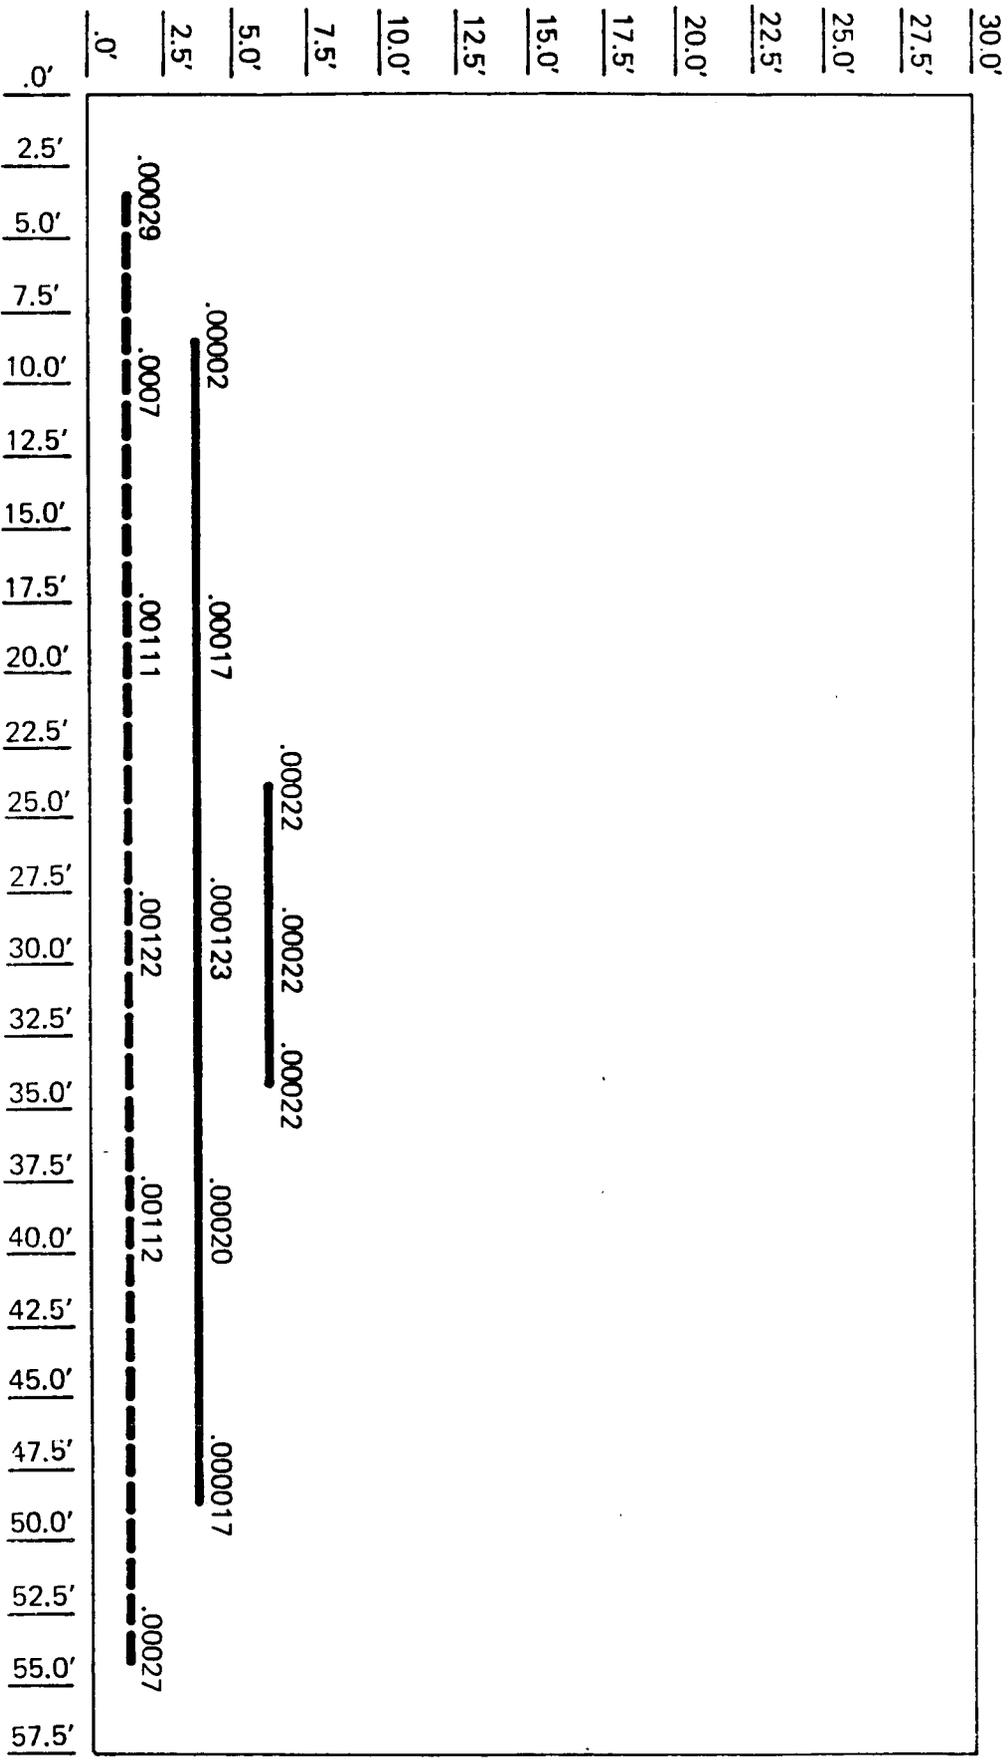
CONDENSATE STORAGE TANK AREA WALL (a)
